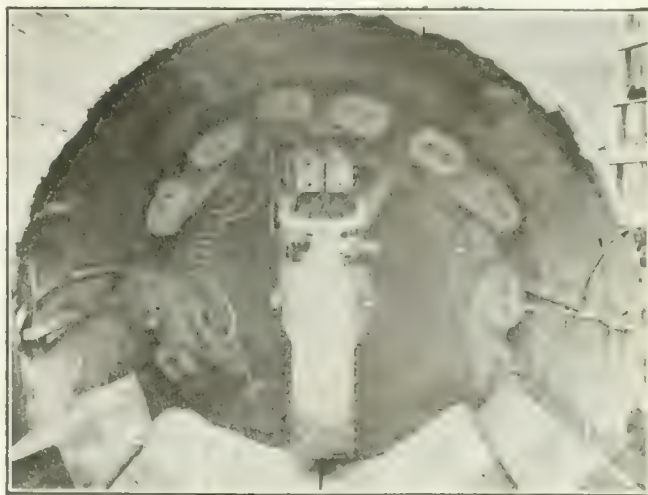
FLUSHING SHIELD STARTING OUT FROM SHAFT, ERECTOR MOUNTED ON REAR OF SHIELD
